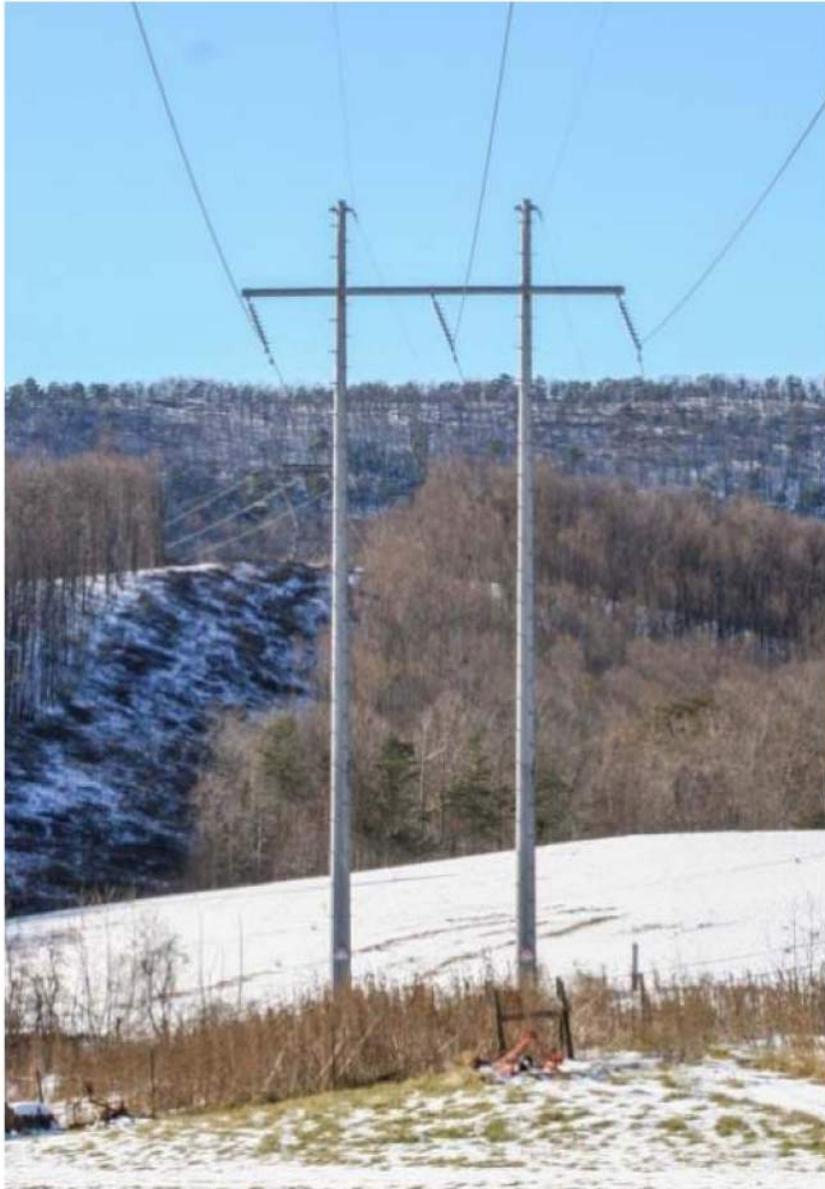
PROPOSED 138 KV H-FRAME
